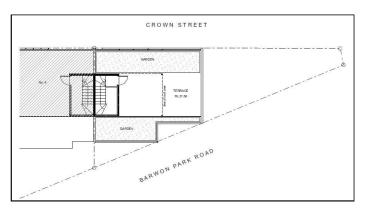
Existing roof terrace level plan (Source: Archispectrum)
